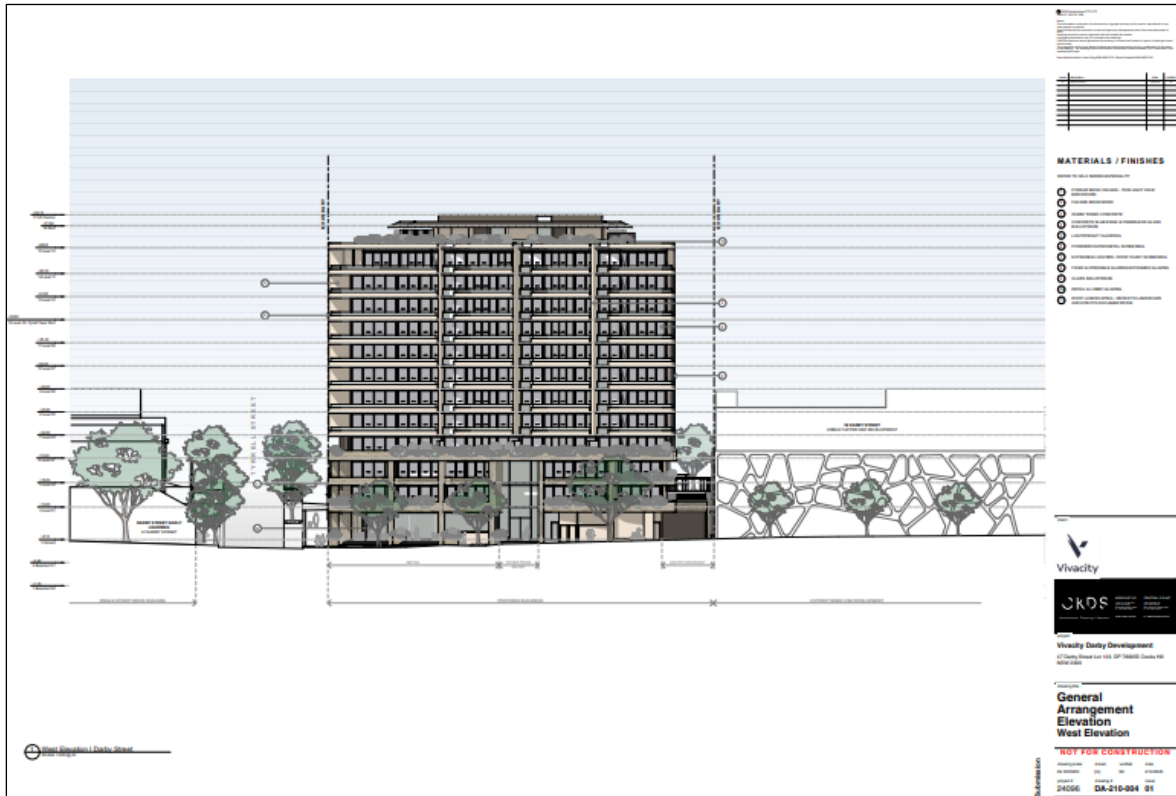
Darby Street Elevation. Source: CKDS December 2025
